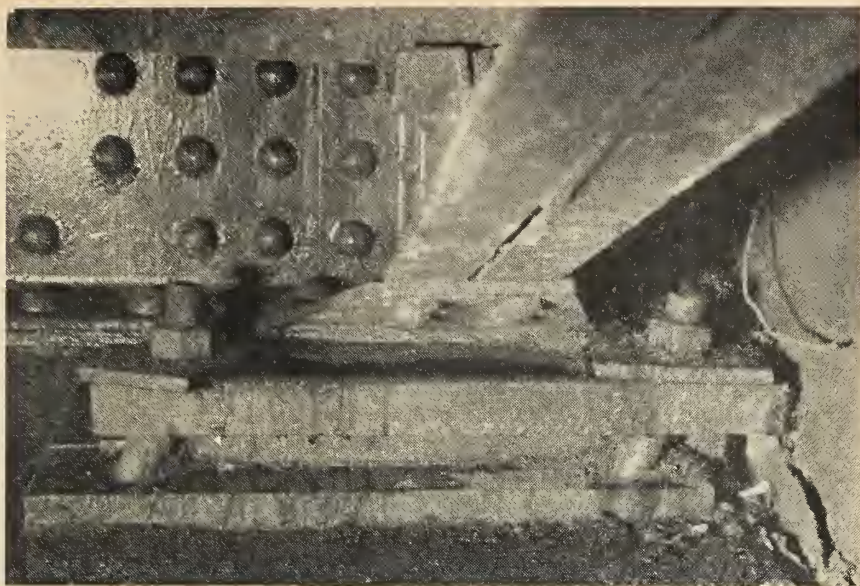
Expansion Bearing Approaching Failure — Wellington St. Bridge.
